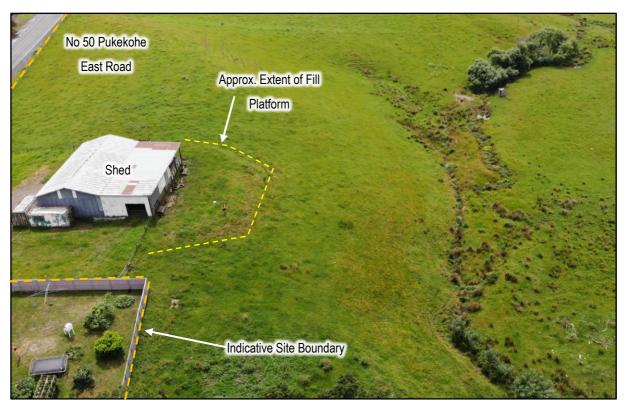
Apparent Fill Platform Below Shed (Source: On-Site Photos)
